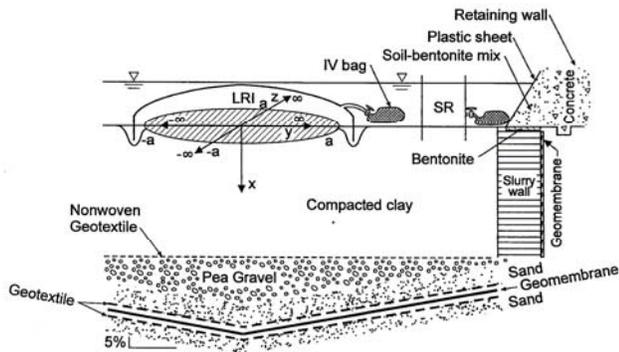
Cross sectional profile showing a LRI, SRI, IV bags, the underdrain collection system and the perimeter retaining wall and slurry wall.
